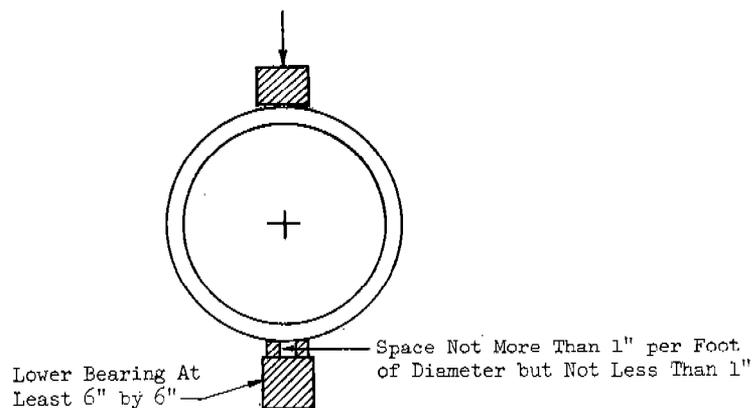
Arrangement of conduit and bearing blocks for standard three-edge bearing laboratory tests of culvert pipe
